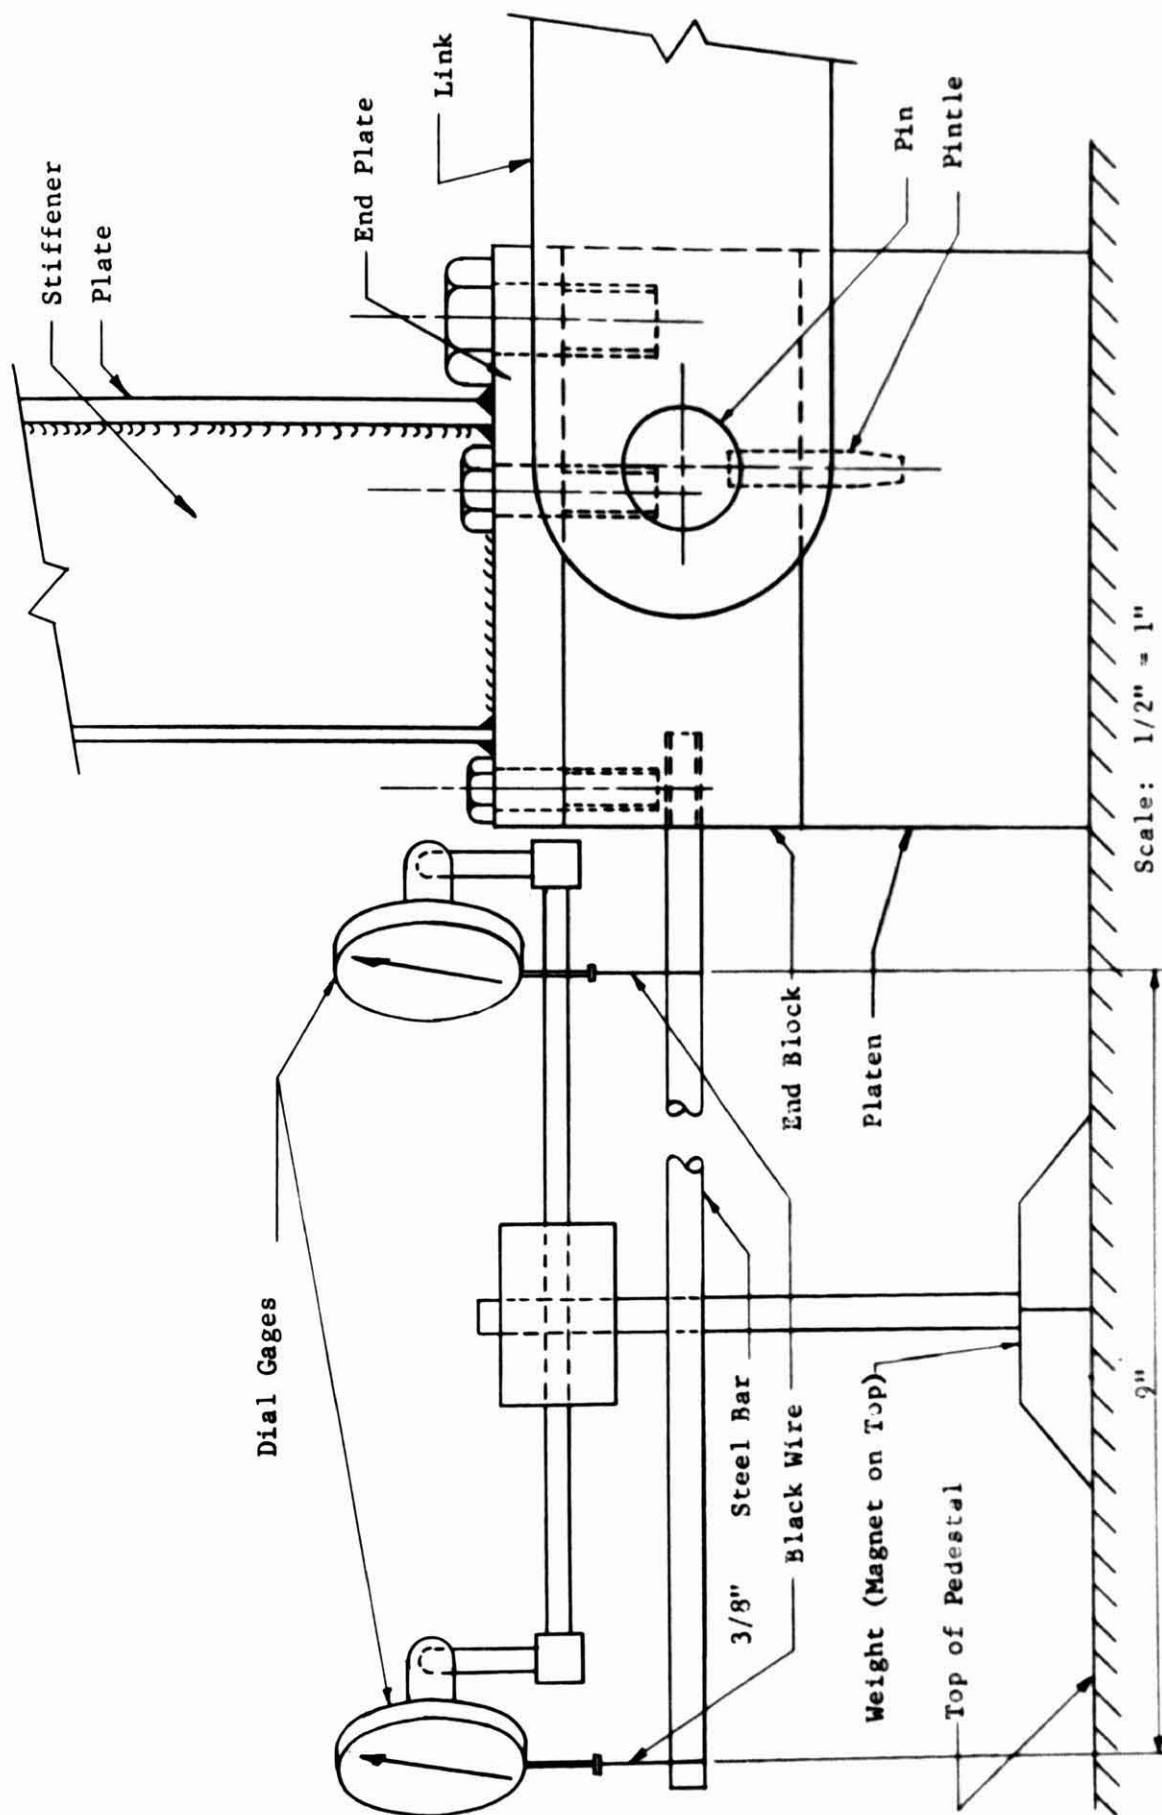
END FIXTURE AND ATTACHMENT OF S-DIAL GAGES
